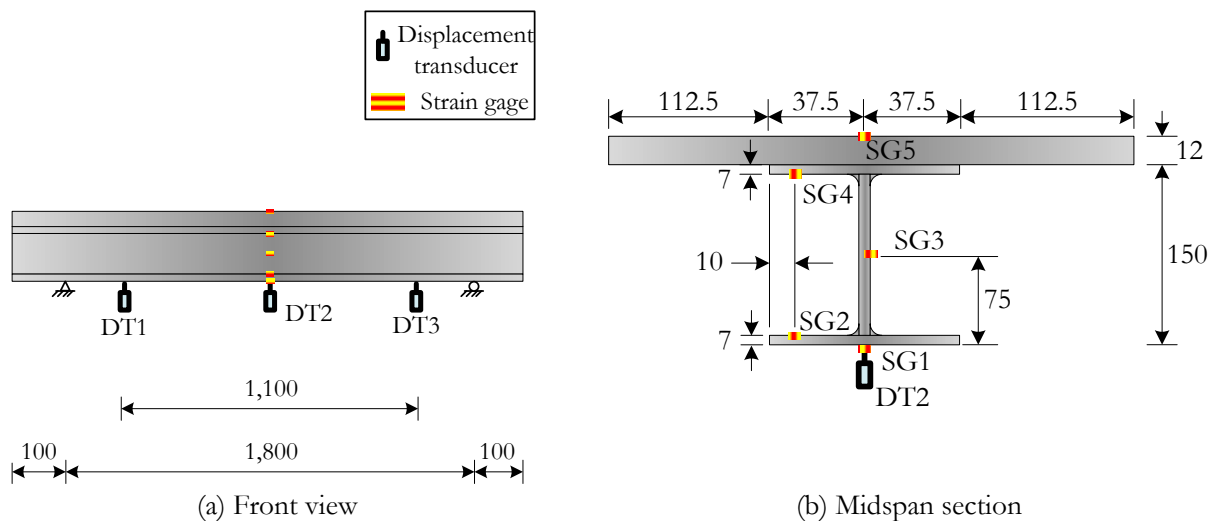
Instrumentation for control (unstrengthened) steel beam (all dimensions in mm).
